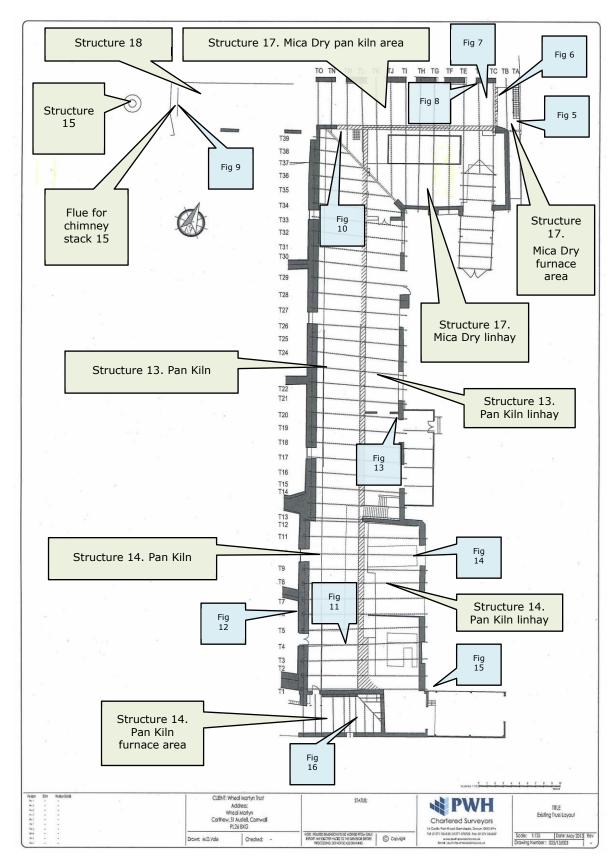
Plan of Mica Dry, and Pan Kiln Building. Location of photo's shown in blue.
